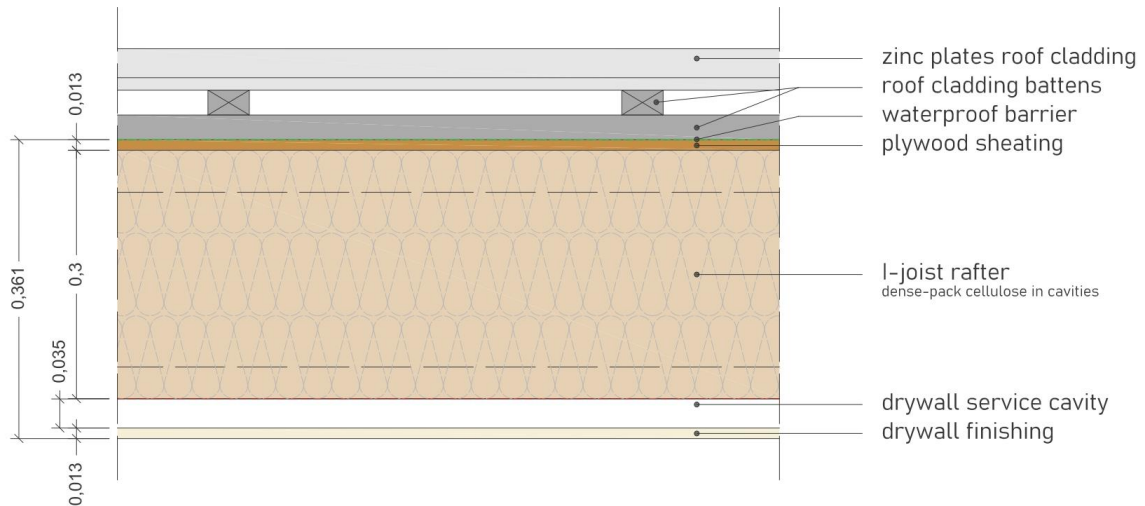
Roof system detail section. Dimensions in meters. Own elaboration.
